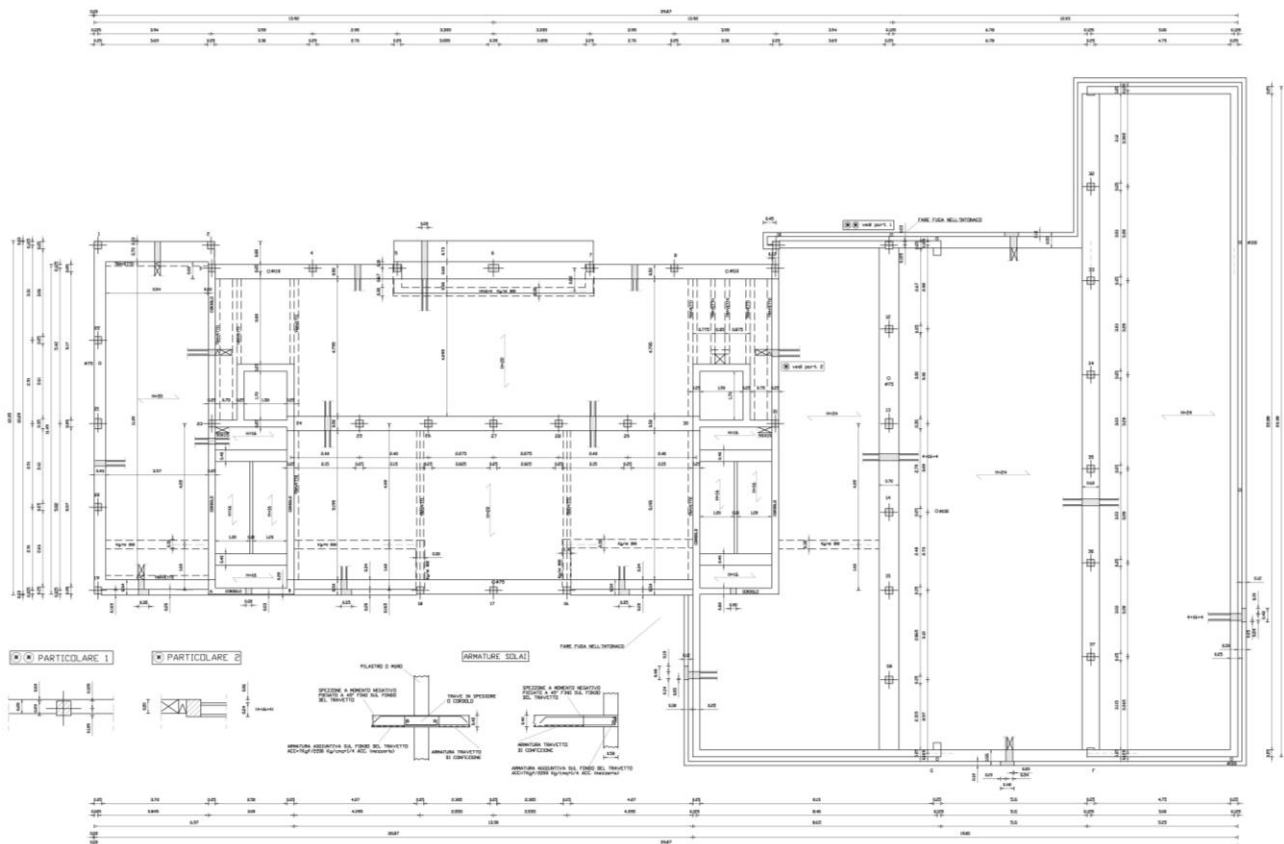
Technical drawings of the structure of the first floor – Source: [151]
